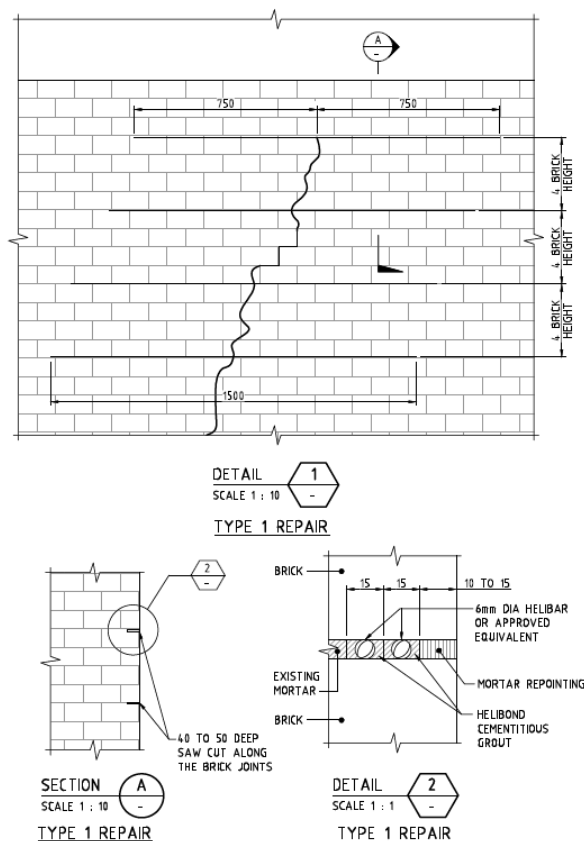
Areas of brickwork requiring crack-stitching (SMEC).
